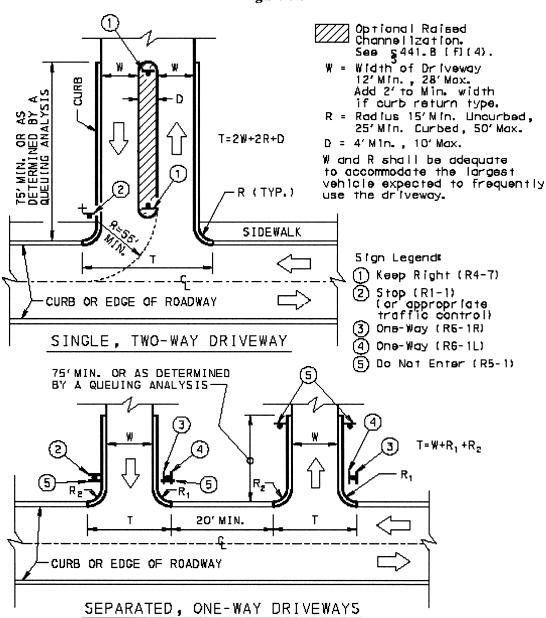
, TYPICAL LOW VOLUME DRIVEWAY
